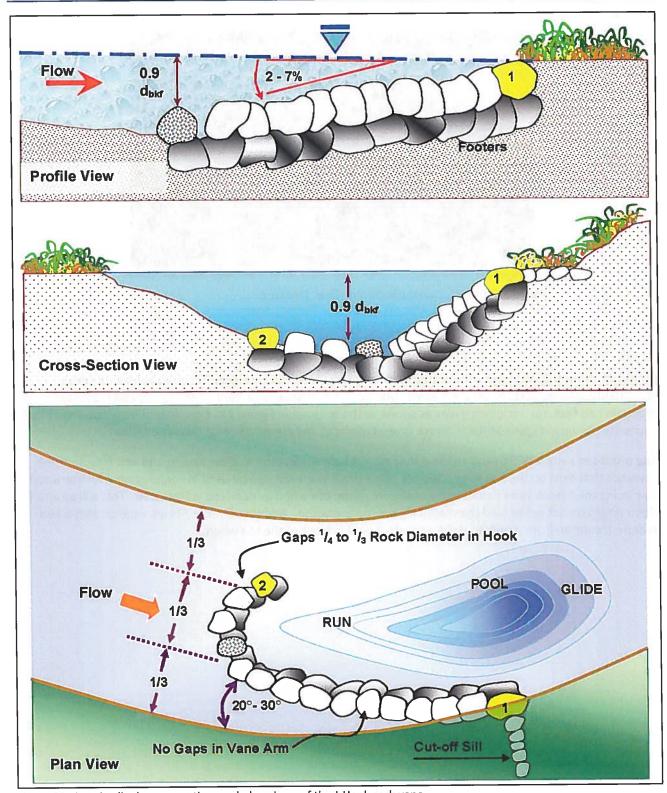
Longitudinal, cross-section, and plan views of the J-Hook rock vane.
